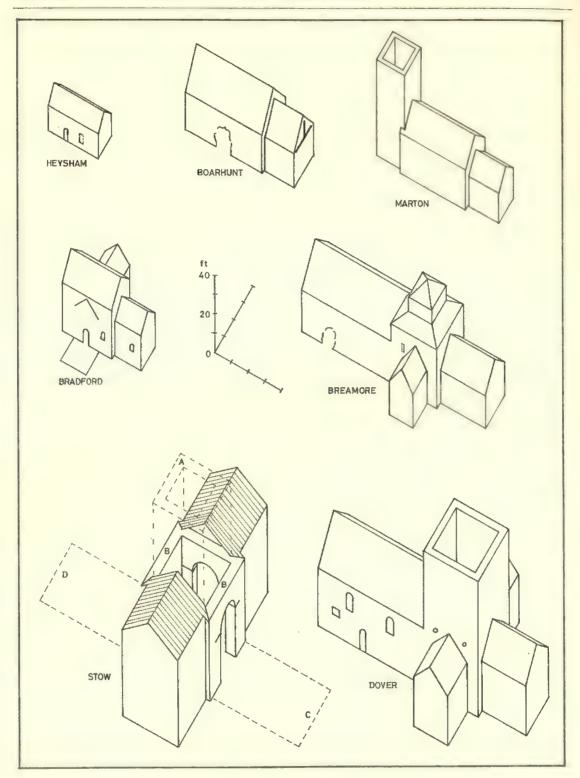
EXTERIOR APPEARANCE OF TYPICAL CHURCHES
